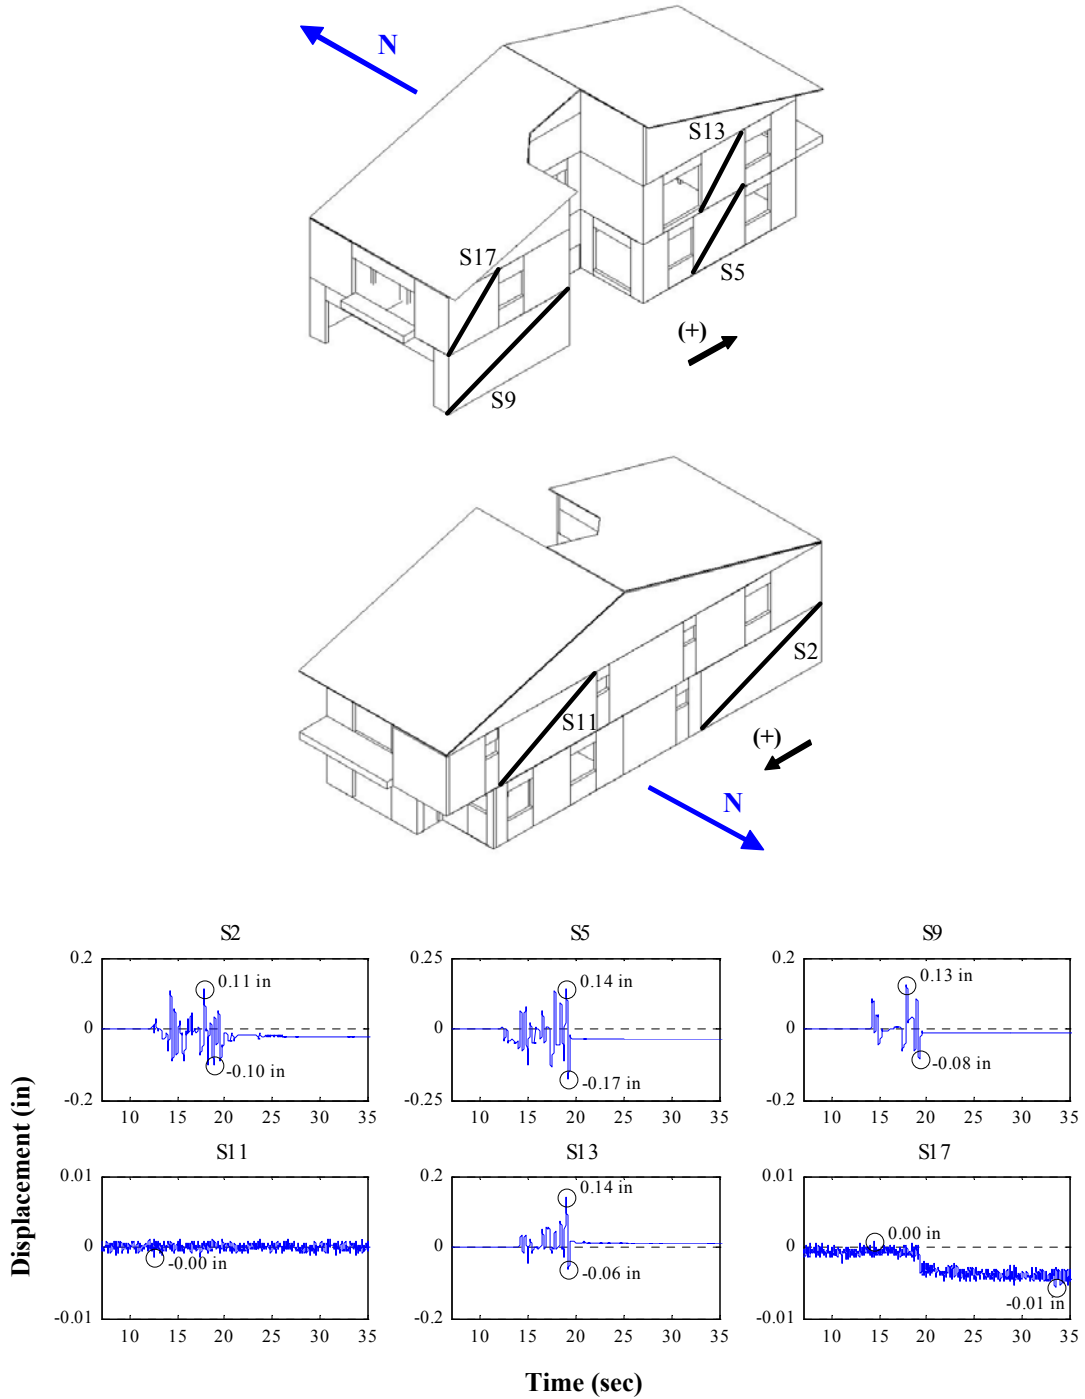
Wall deformations of east-west external walls for Test NWP1S017
